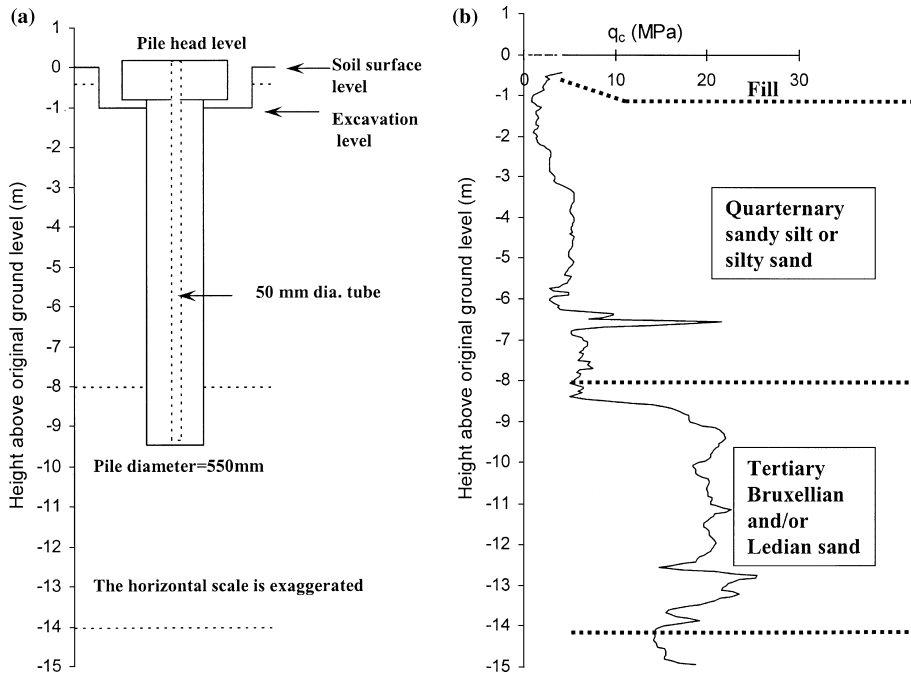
(a) Elevation of typical pile (pile A2) (b) Typical  $q_c$  profile (site A2).
